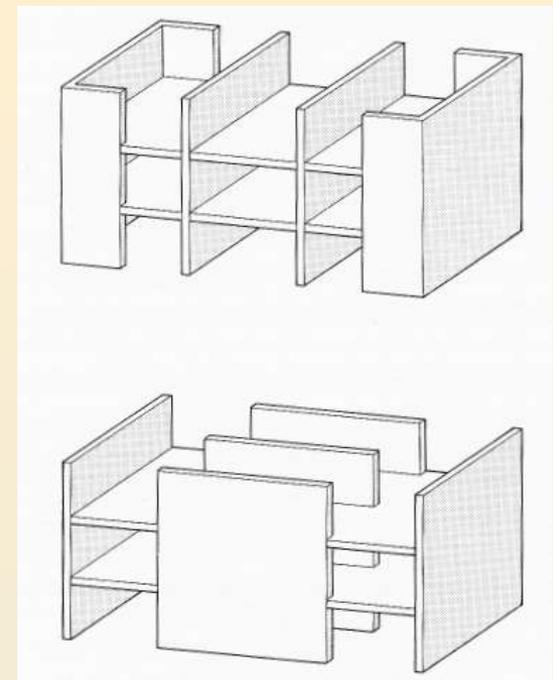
Loadbearing masonry buildings are normally multi-cellular structures which contain walls running in two orthogonal directions. The arrangement is inherently stable.
